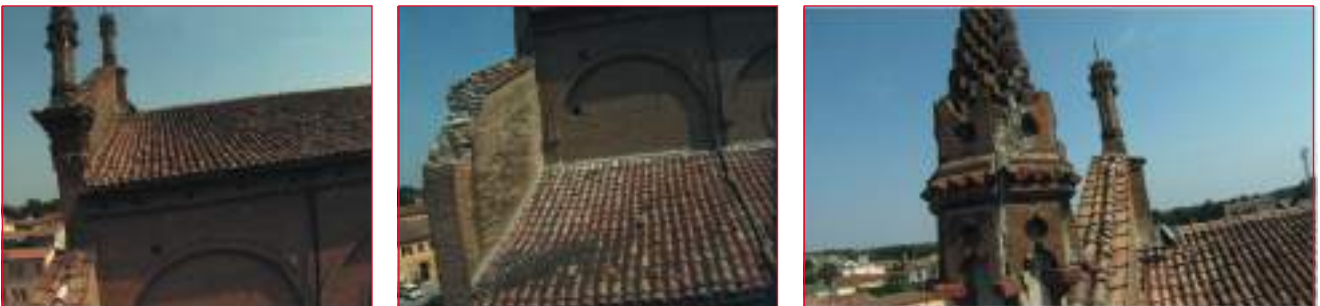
Images acquired by helicopter: visible damages on masonry, slab and roof
